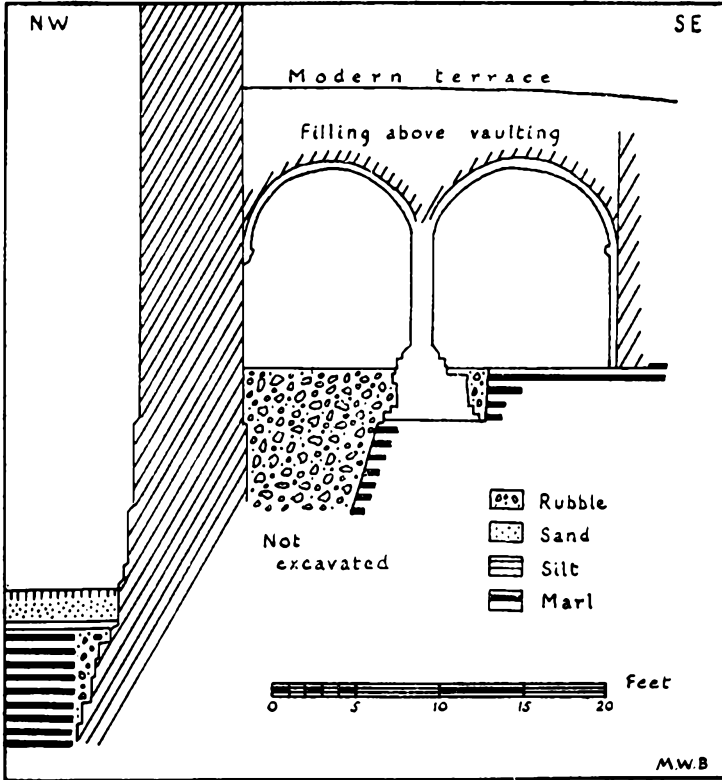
NEWARK CASTLE : SECTION THROUGH CRYPT
